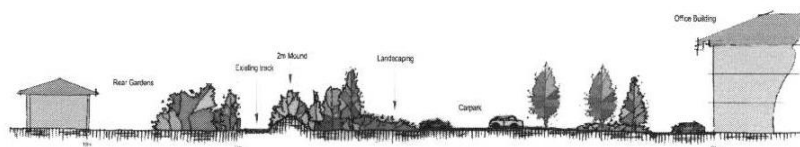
Section 1 -Through Existing Housing, Screen Planting and Car Park
